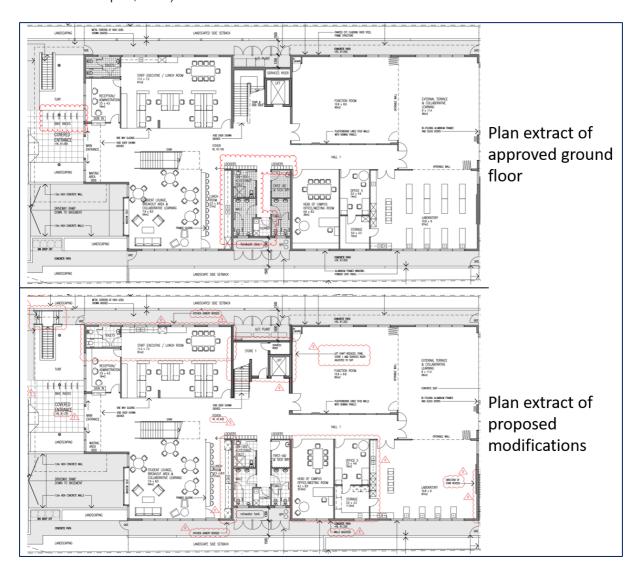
| Approved (above) and proposed (below) Ground Floor layout (Source: Applicant's Modification Report, 2022)
